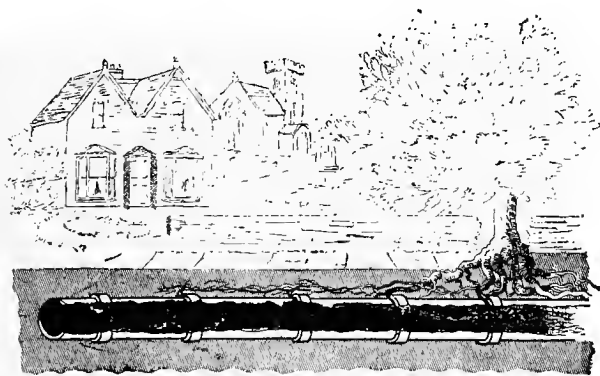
Tree roots entering pipes laid with inferior mortar.
